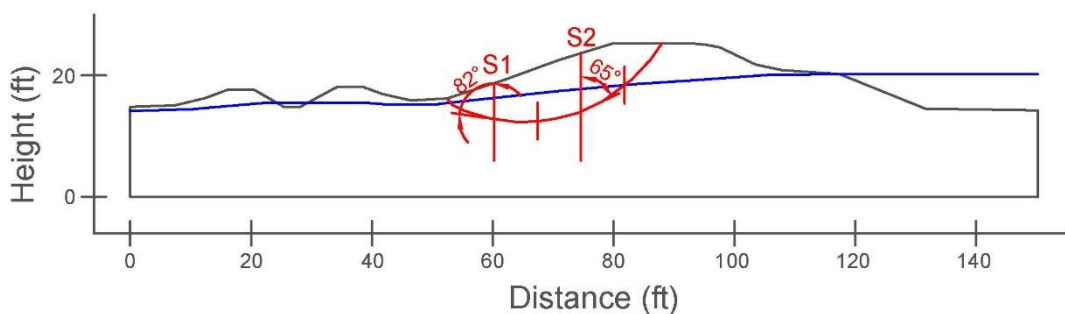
Sub-sectioning of the cross-section and failure plane Solfatara Canal Dike
